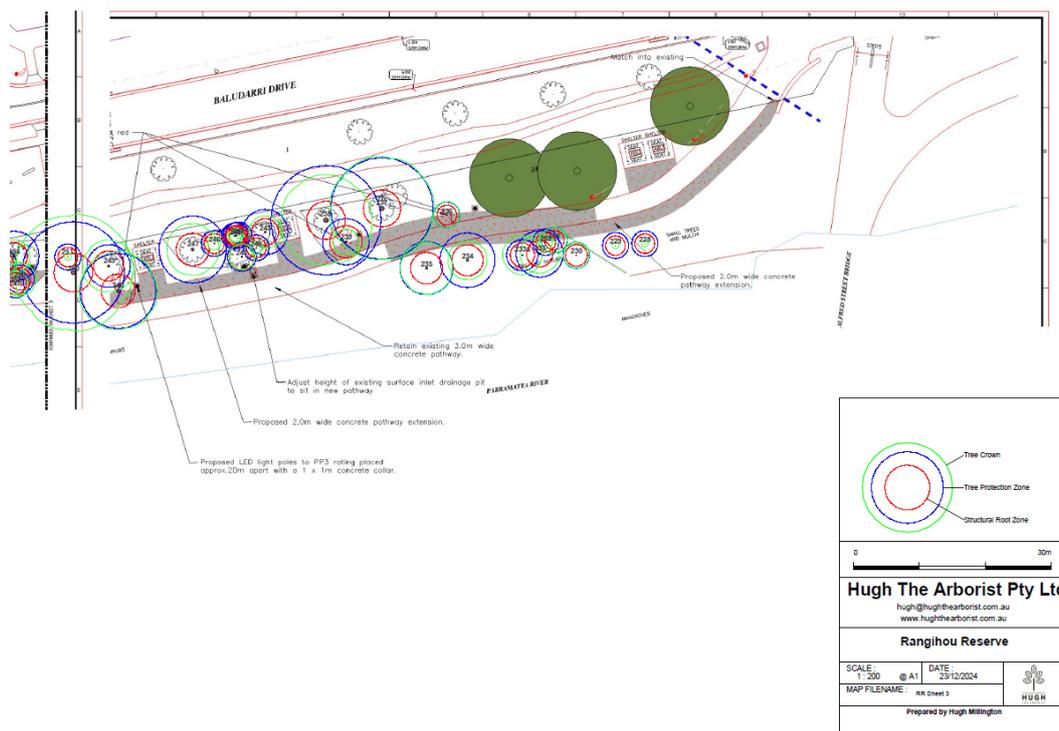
Site Plan (Sheet 3). Source: Hugh The Arborist
